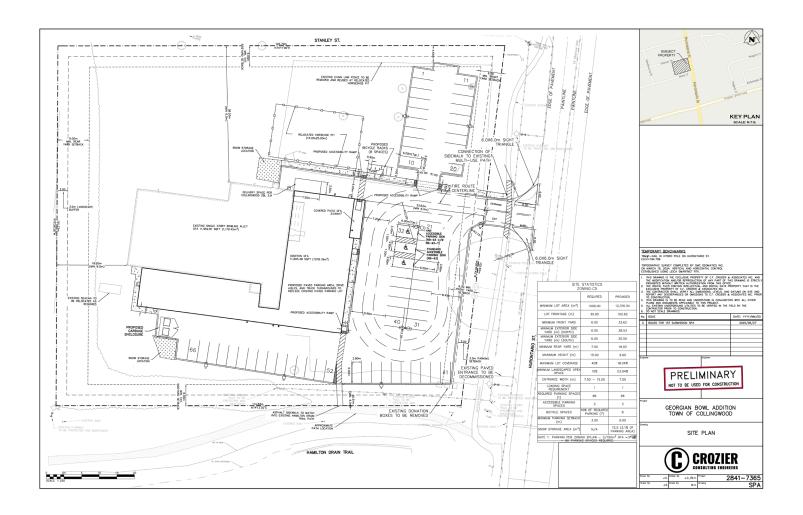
Proposed Site Plan (C.F. Crozier & Associates Inc.)
